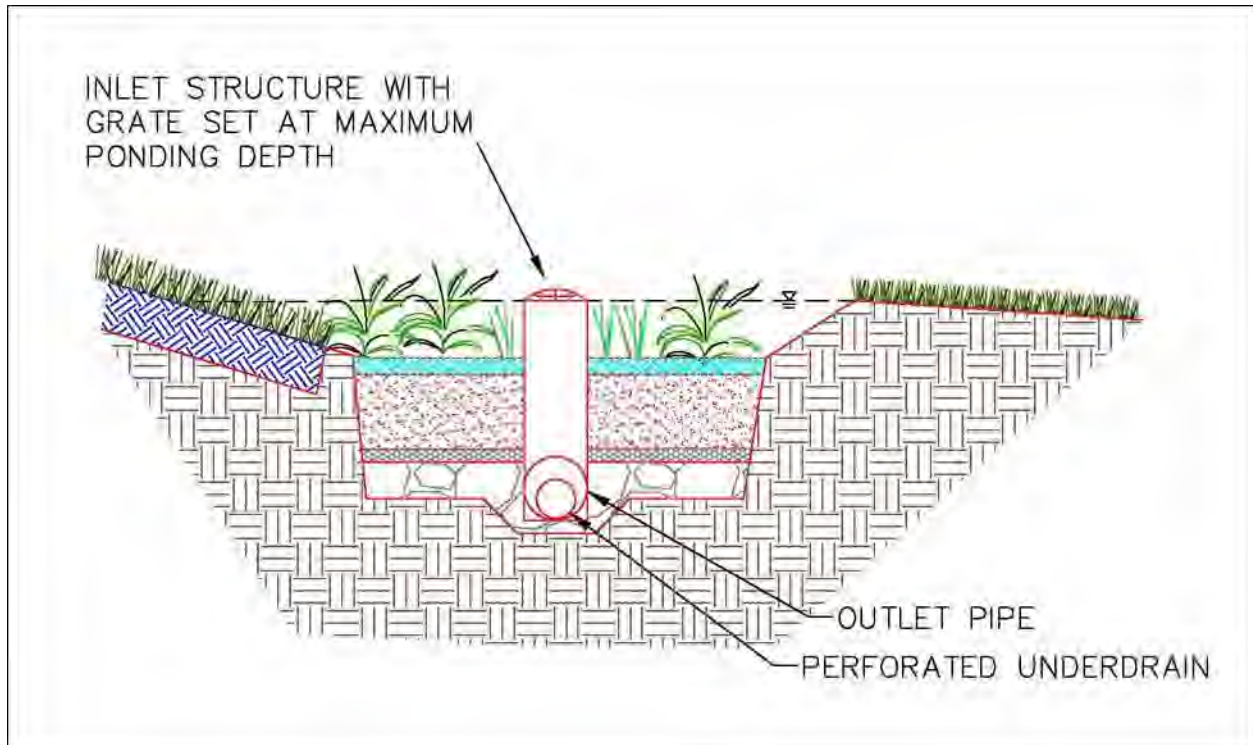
Example design of an on-line bioretention with an overflow structure.
